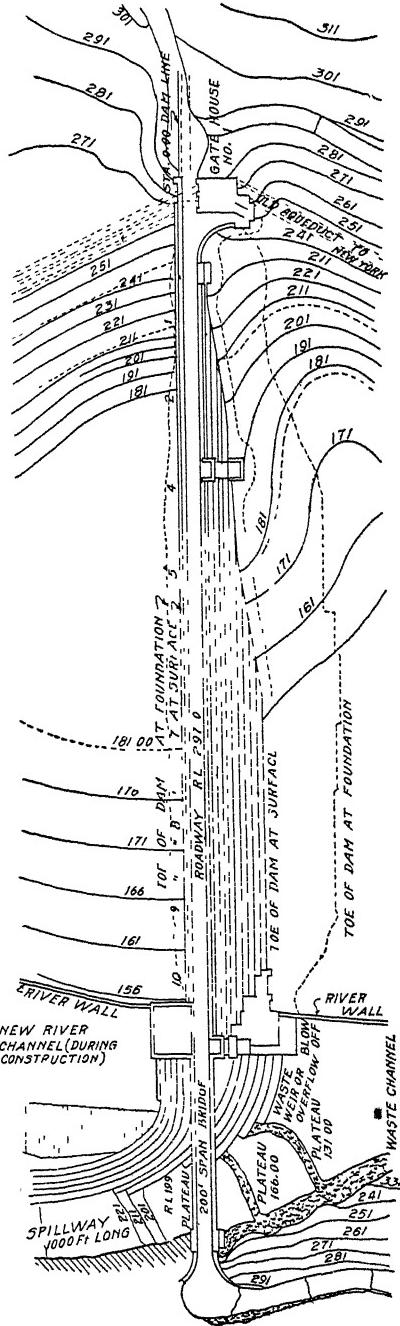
Plan of New Croton Dam for New York City Water Supply
